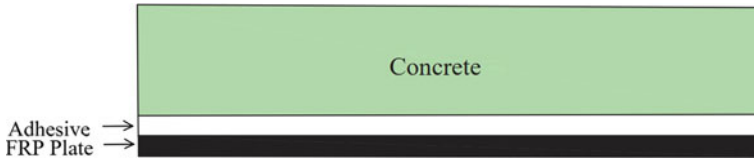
Cross sectional configuration of concrete, adhesive and FRP composite
